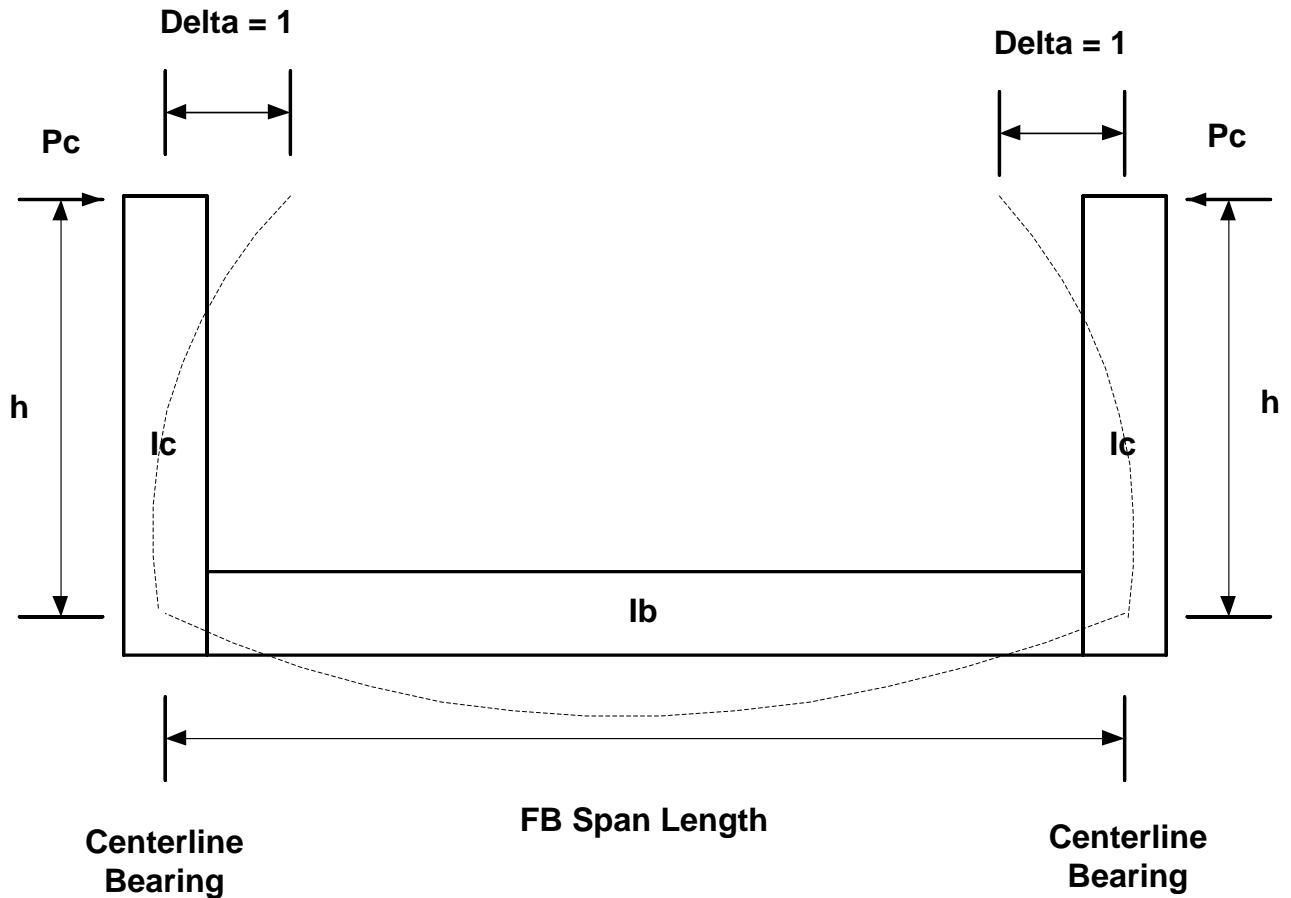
Lateral U-Frame of the Pony Truss
